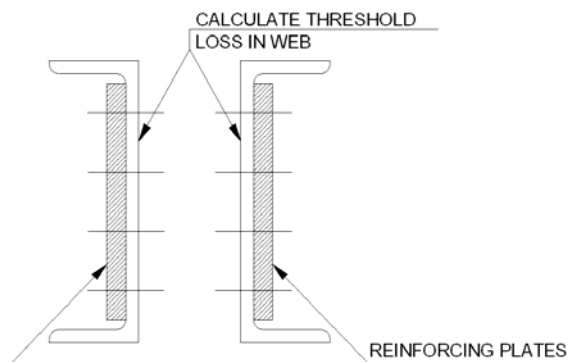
Reinforcing Plates Added to Bottom Chords in Spans 3 and 4
